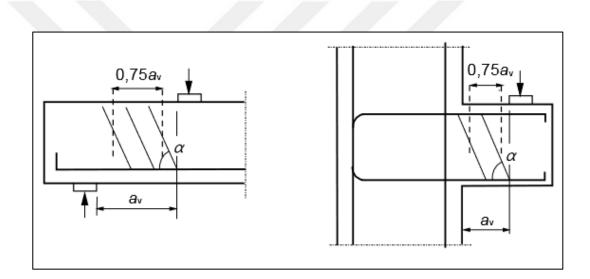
Shear reinforcement at non-slender member[6] (adapted from EC2)
